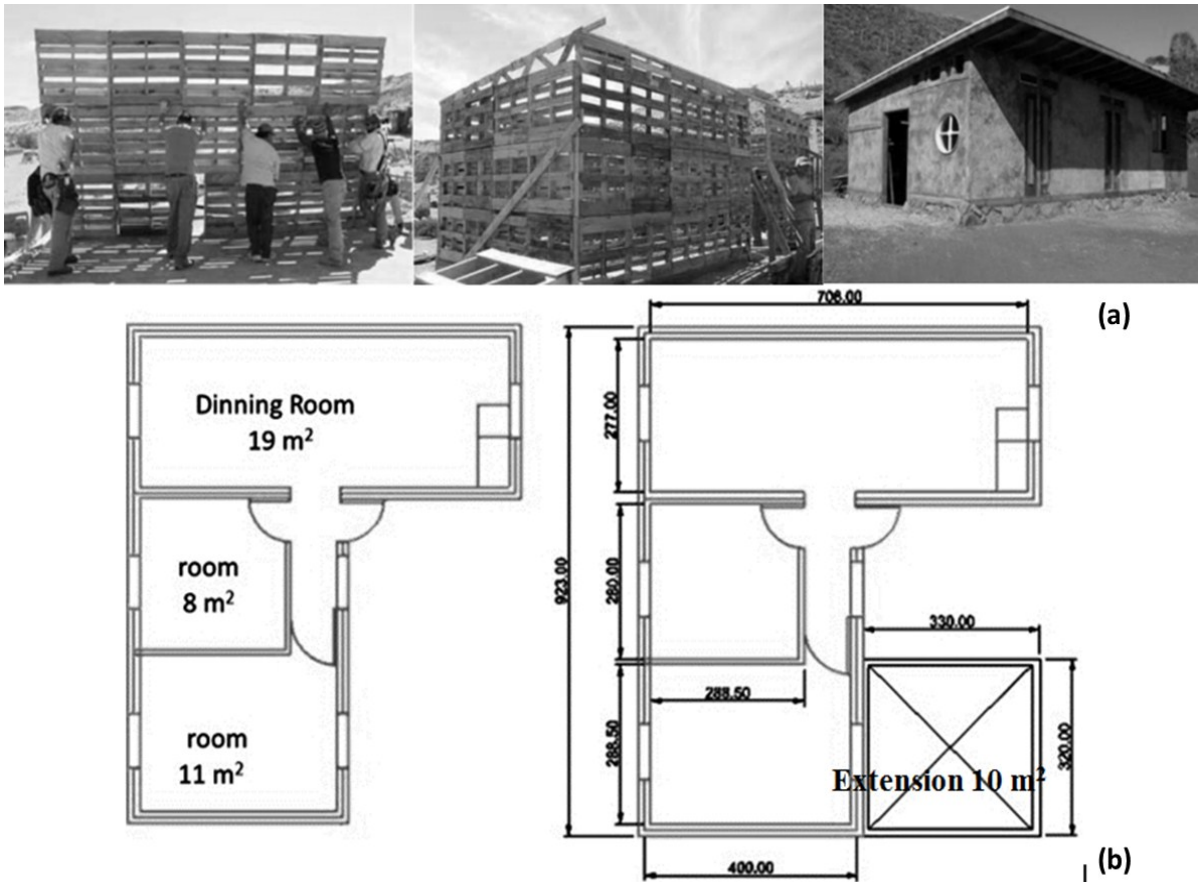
Pallet house prototype: (a) The process of pallet house construction, (b) The plan of the pallet house example (<http://unitingalcantara.wordpress.com/2010/05/15/>).
